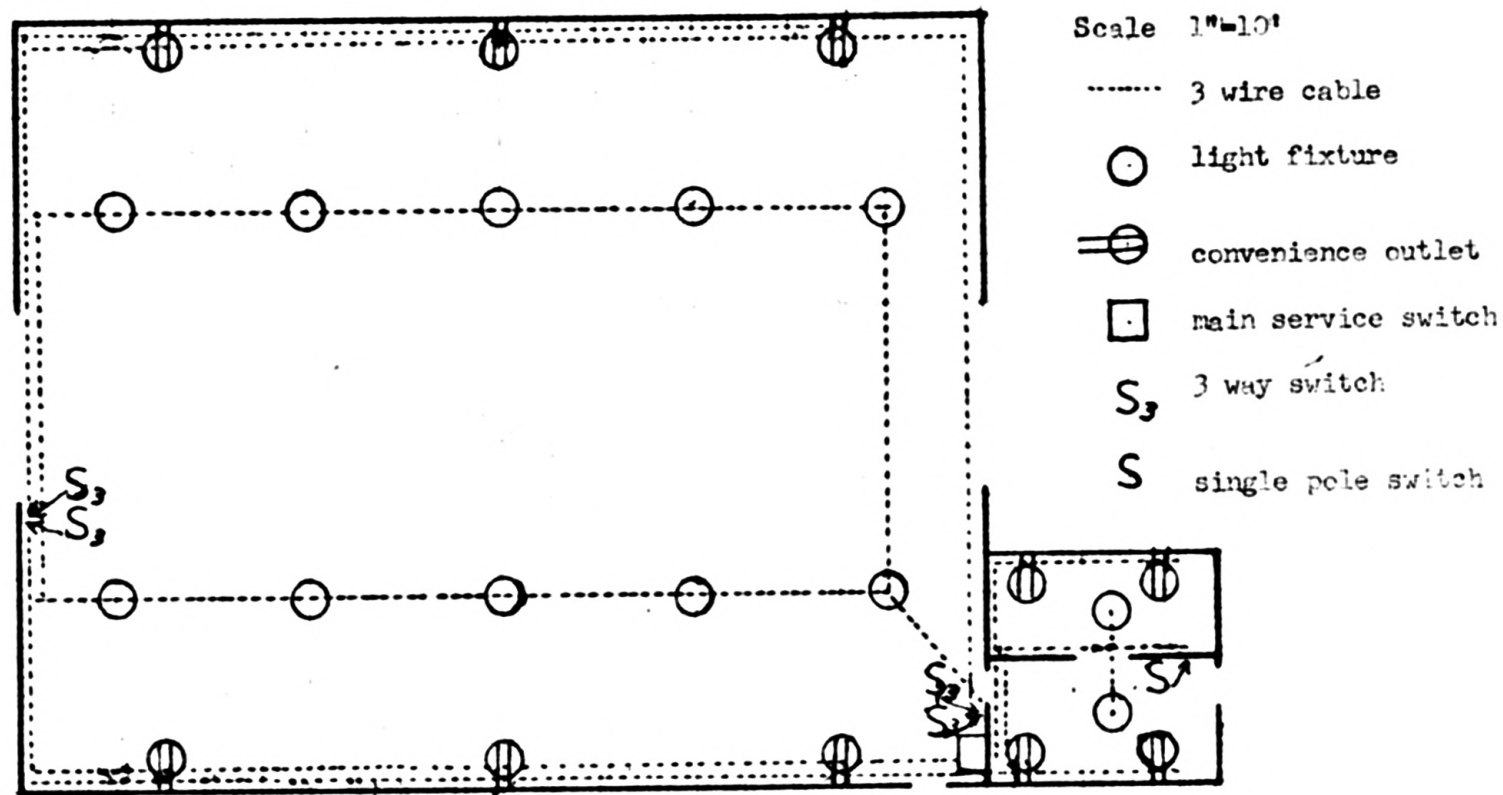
A diagram showing the wiring system for a 40' by 50' completely-enclosed laying house, including egg room, adapted for cage systems and floor plan operations.
